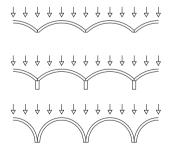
Retaining wall with "arch" form Schematic plans (from top to bottom): - simple "arches"
